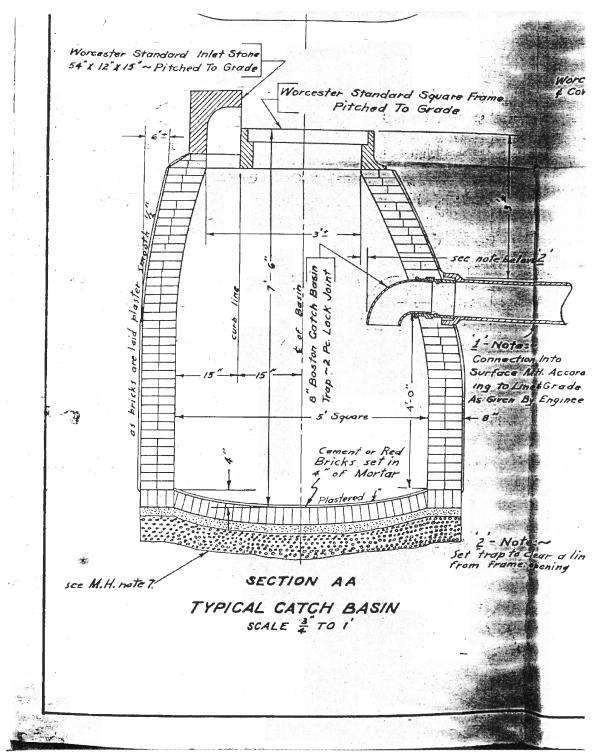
A TYPICAL CATCH BASIN SURROUNDED BY BRICK.
